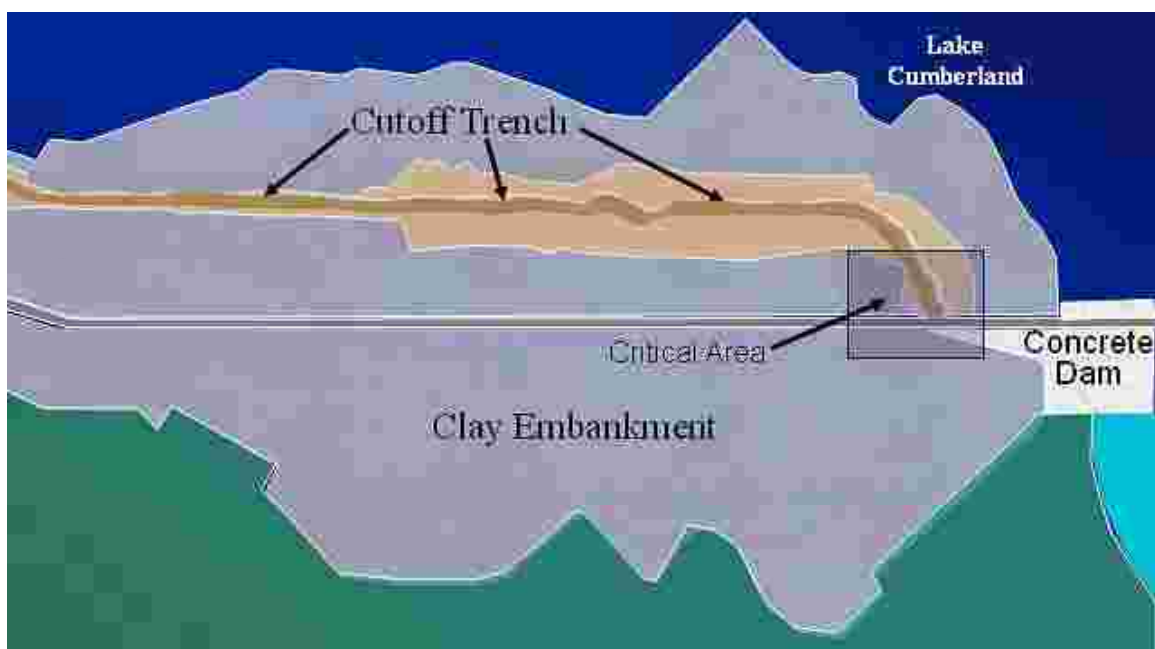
Location of Cutoff Trench in Relation to Embankment and Concrete
